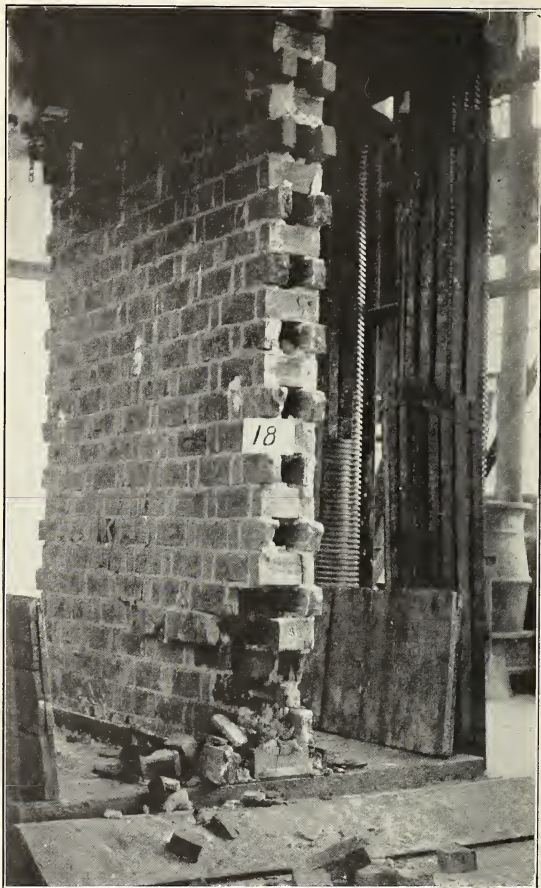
Compression test of 8-inch hollow wall of brick. Bureau of Standards, Washington, D. C.
